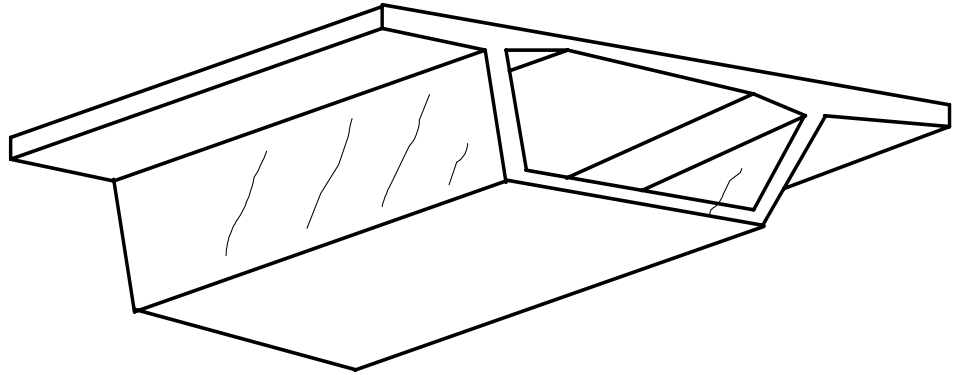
Box Girder Cracks Induced by Shear
